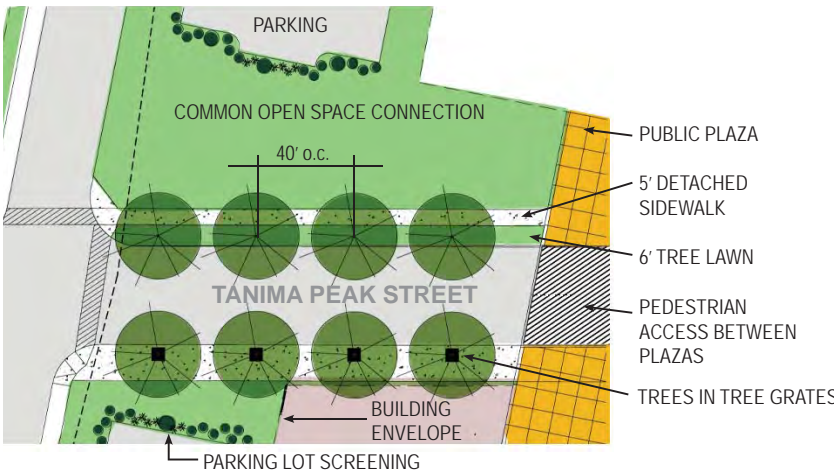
Tanima Peak Street Landscape Treatments, Plan View
